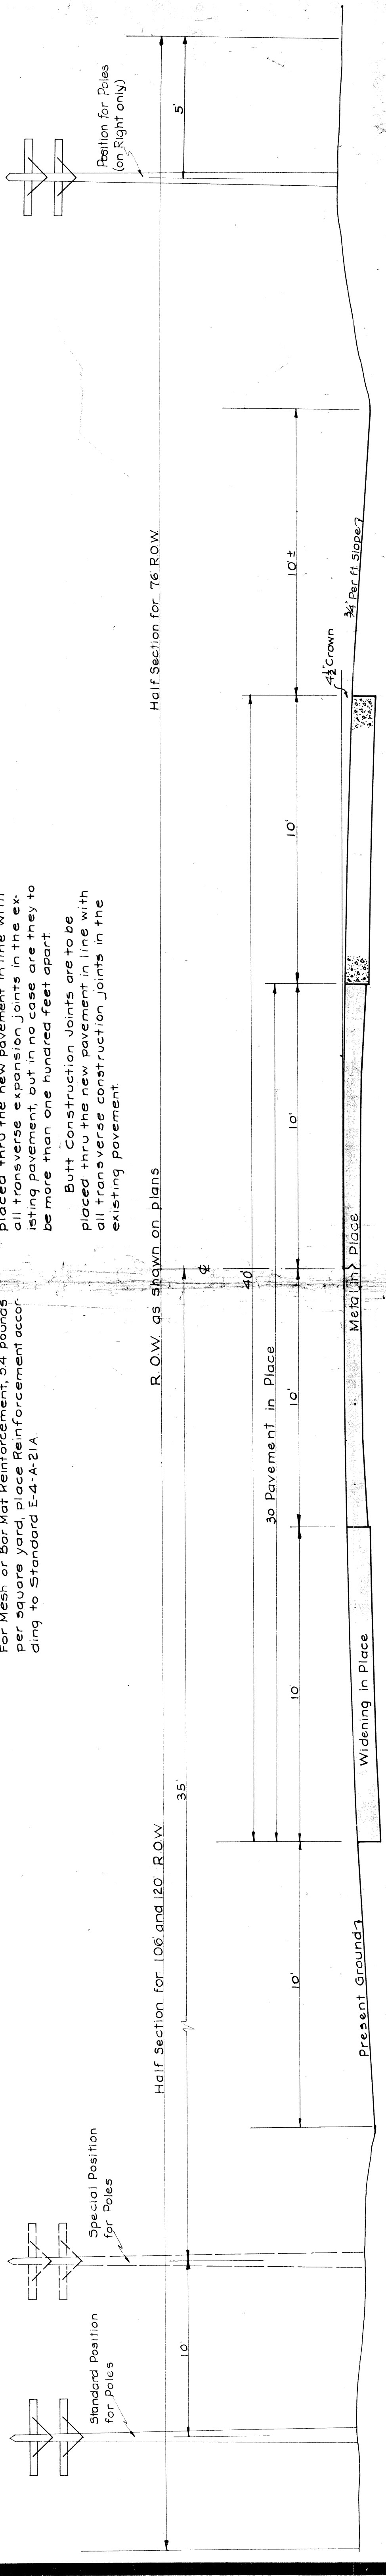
DETAILED SECTION FOR 10 FOOT CONC. PAVT. 10 IN. UNIFORM REINFORCED
